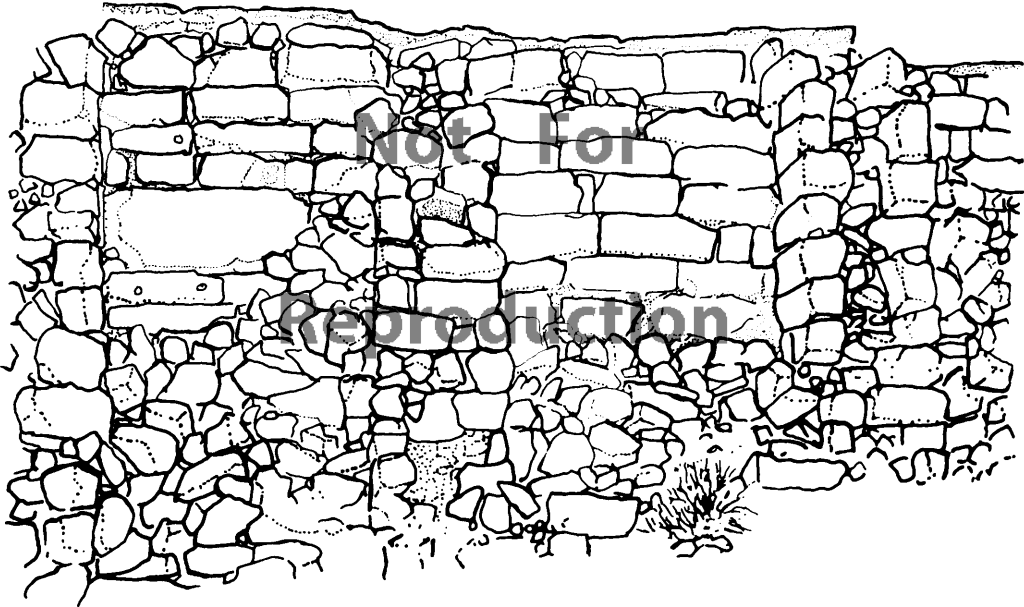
North Sluice Core Structure. The ashlar facing has been completely stripped away to reveal the system of transverse and longitudinal stiffener walls of coursed roughly squared blocks set in mortar (coffer construction). The coffers were filled with less consolidated random rubble which, lacking the confinement of the facing wall, has eventually collapsed. The whole unit was given a coping of hydraulic plaster.
